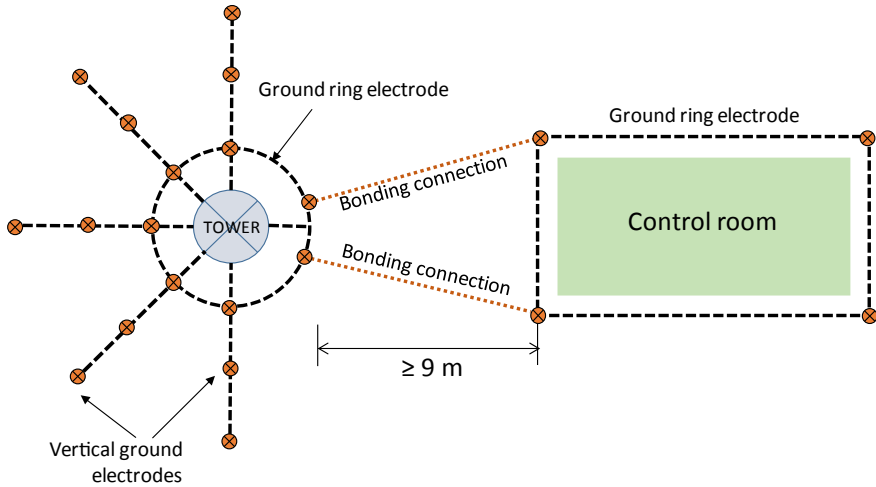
Grounding arrangement recommended for telecommunication tower and control room
